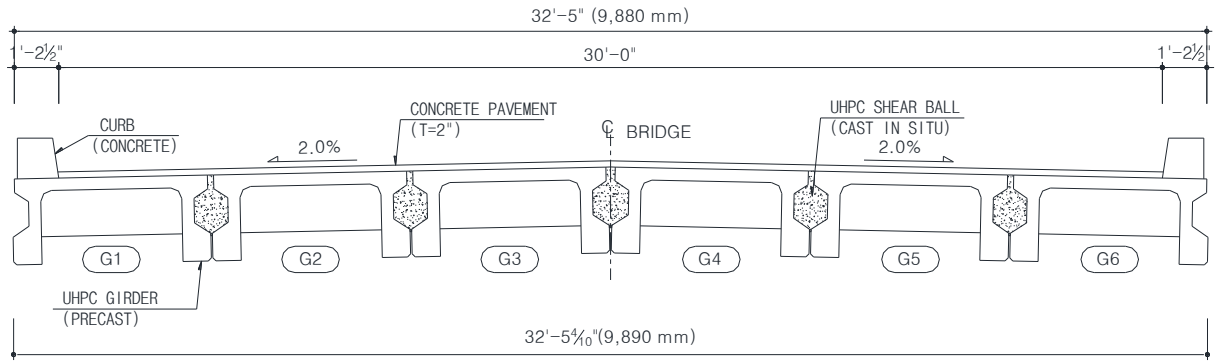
Layouts of Hawkeye UHPC Bridge
